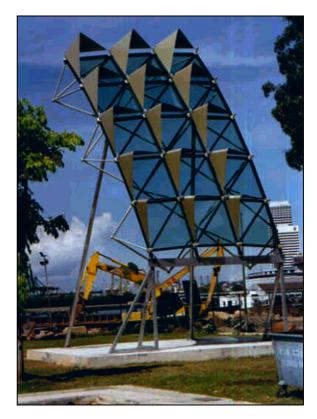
Exterior view of the roof cladding system (Source: Author)
